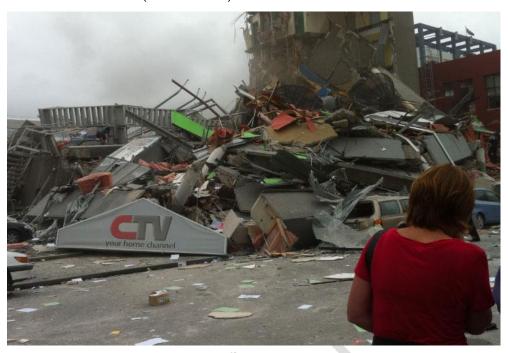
Corner of Cashell and Madras Streets with columns and spandrel panels (msn photo)
